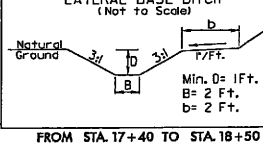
SPECIAL LATERAL BASE DITCH (Not to Scale)
